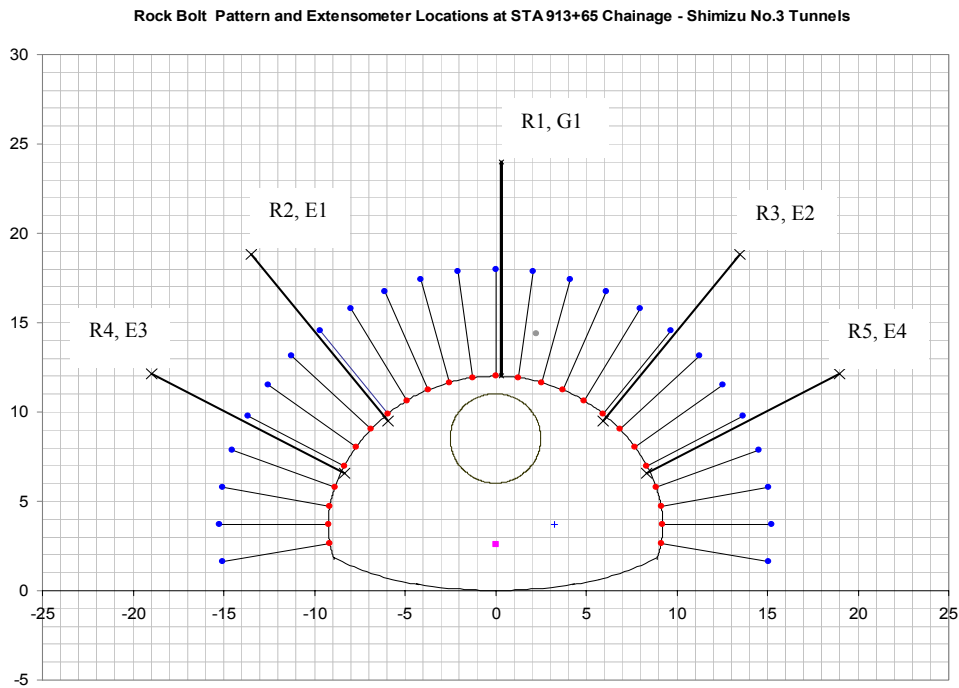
Measurement locations at STA913+65 section. R=measurement anchors, E=extensometers.
